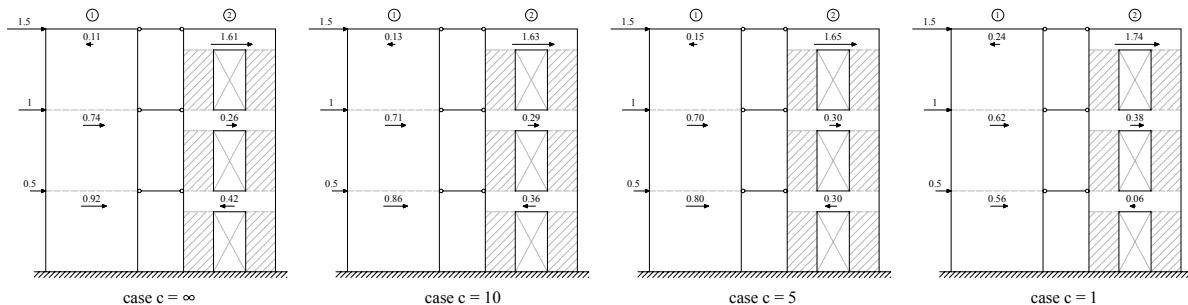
Solid masonry wall – opened masonry wall combined model (case 1)
